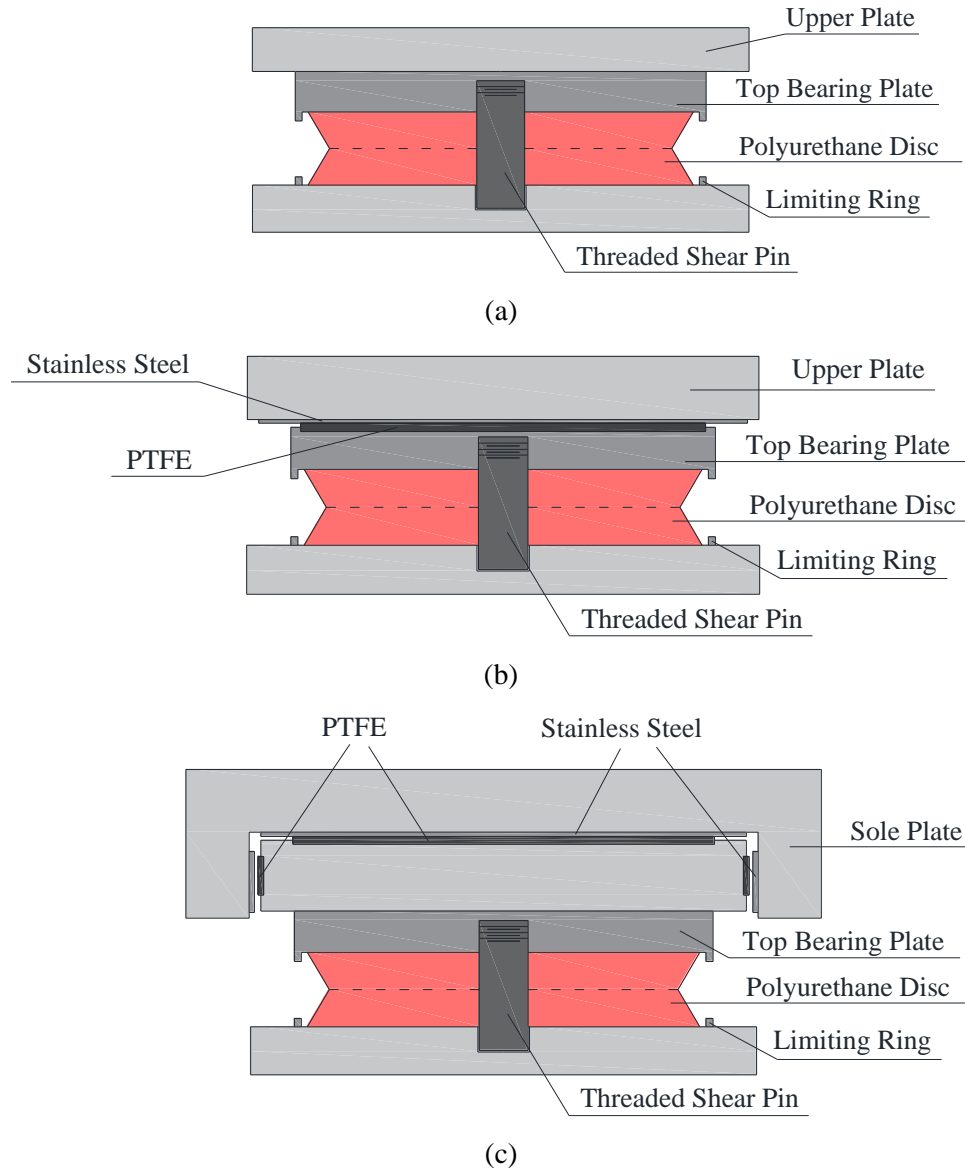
Sketch of (a) fixed disc bearing; (b) guided disc bearing; (c) free disc bearing.
